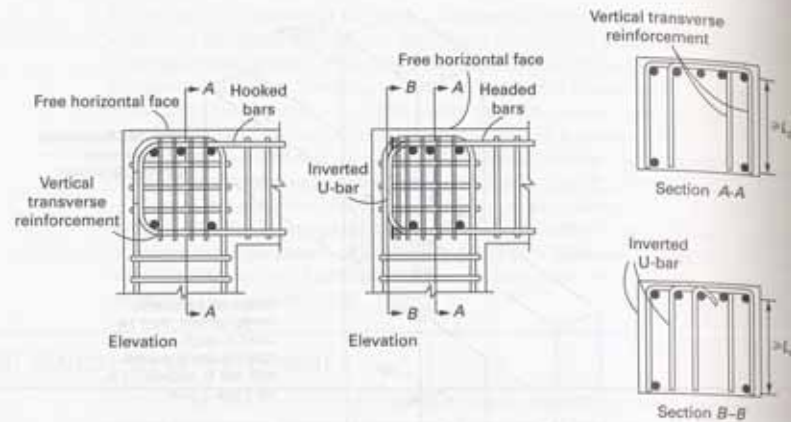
Transverse reinforcement details in joints with discontinuous columns. (Adapted from Fig. 4.2 of ACI-ASCE Committee 352 [11.1].)
